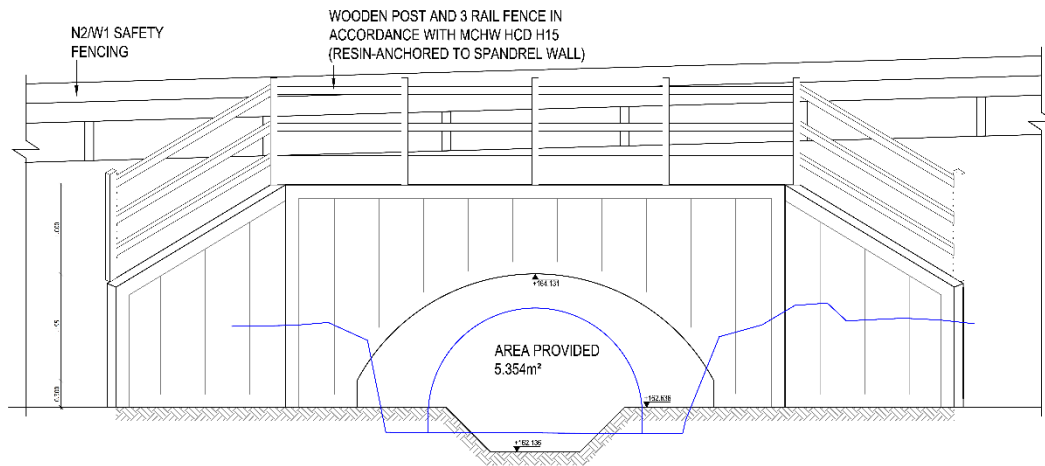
Details of the Existing Blacks Bridge (blue) and the Proposed Blacks Bridge
